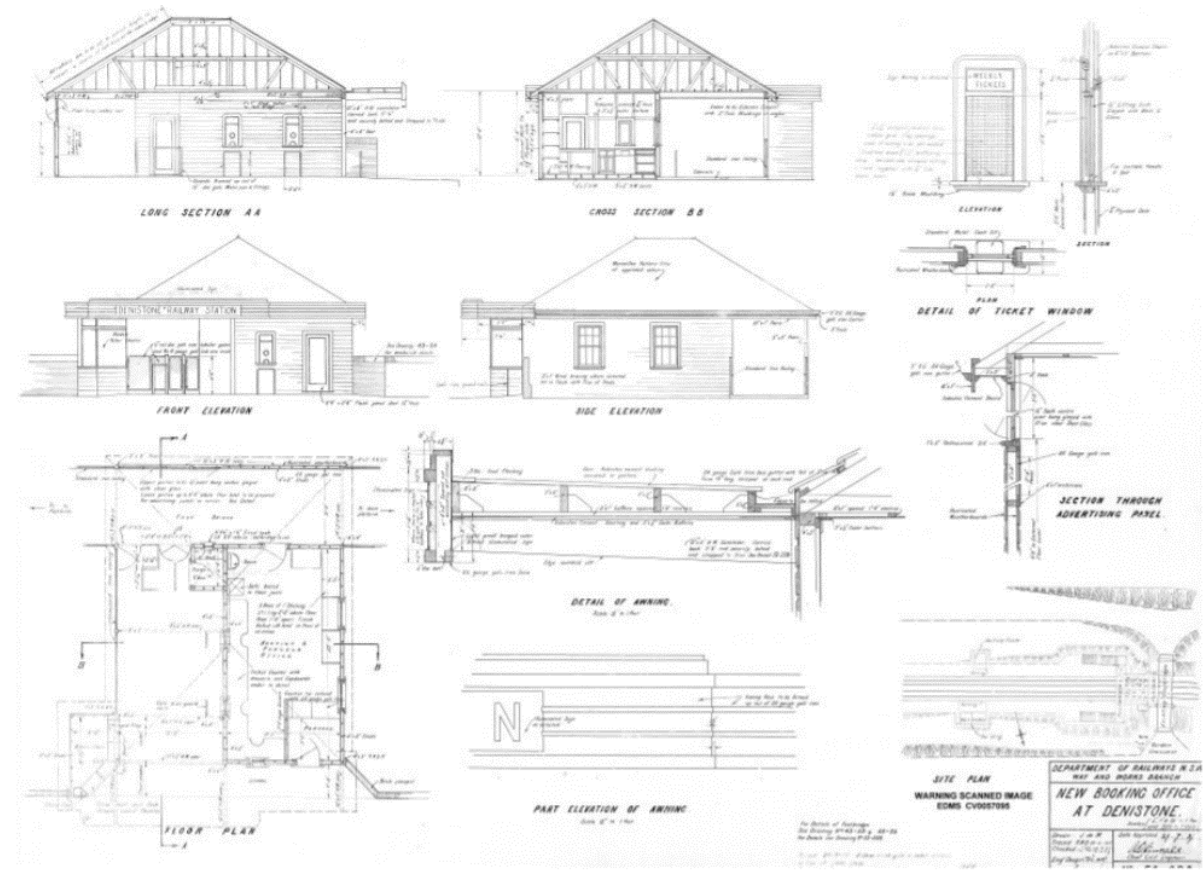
1937 drawings of the platform building at Denistone Railway Station (Source: RailCorp in Arcilla, Gupta and Binkhorst 2019. p. 18)
